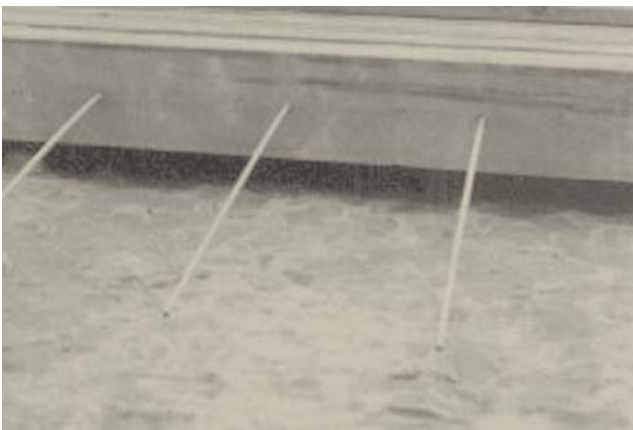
Insertion of prestressing rods through predrilled holes in laminations.
